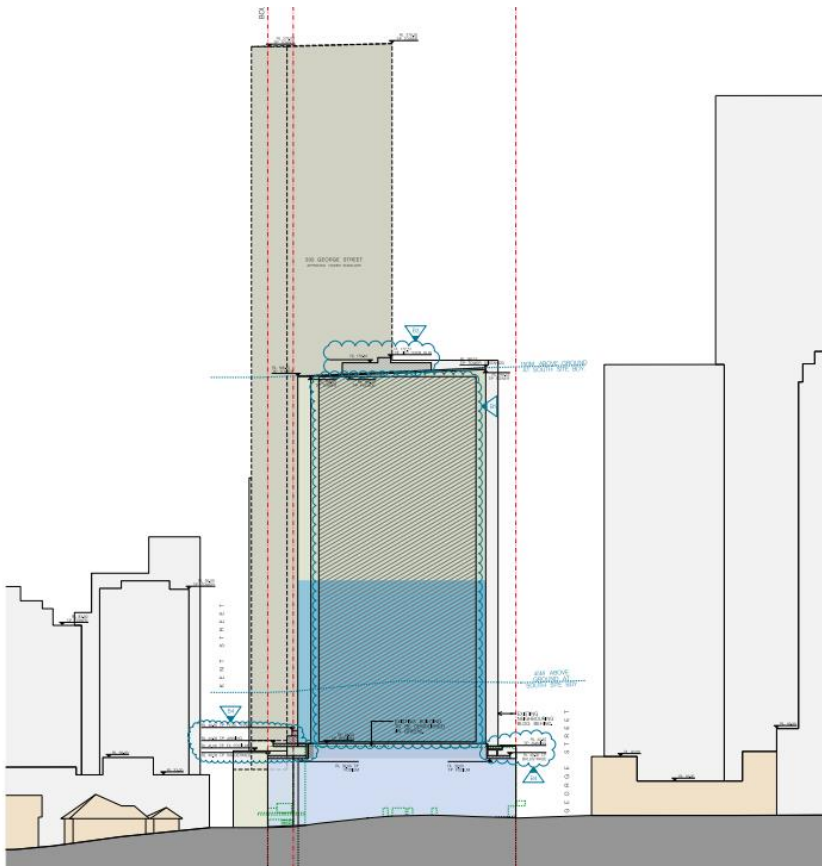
Proposed Albion Lane elevation, areas to be modified clouded
